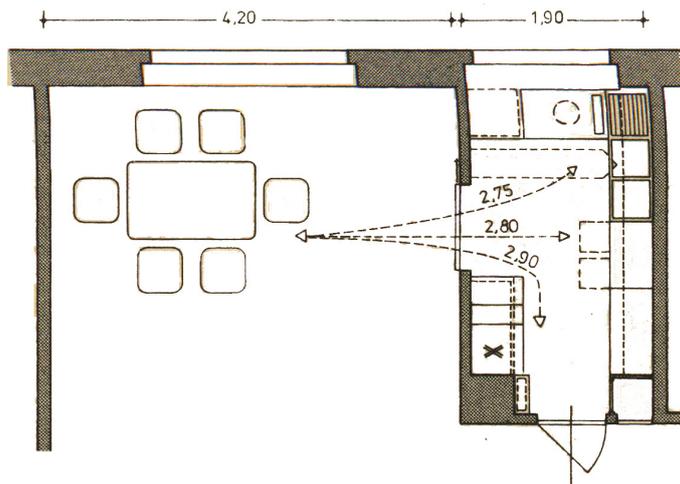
Plan of Frankfurt Kitchen, access to dining area in living room.
